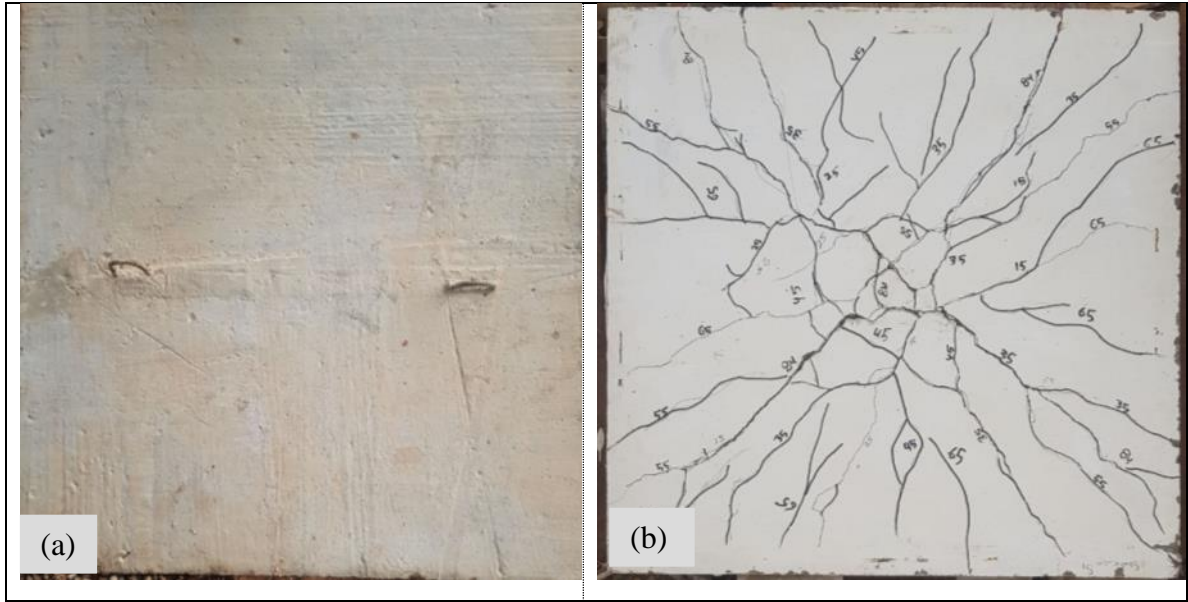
Failure pattern of slab S1, (a) tension zone, (b) compression zone.
